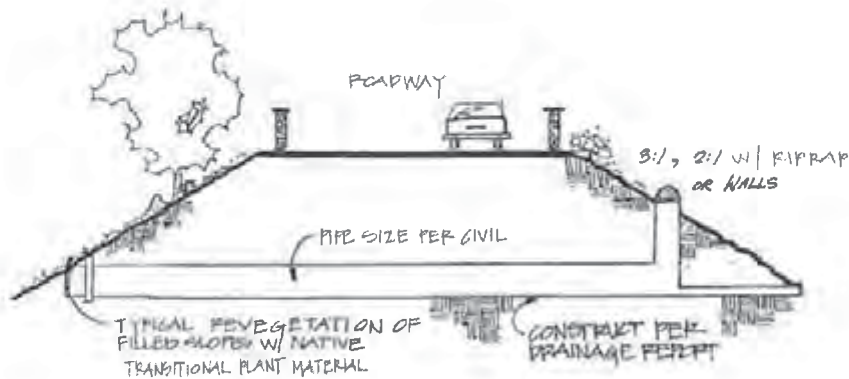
Vertical Culvert End Treatment at Major Drainageway Crossing Cross Section
